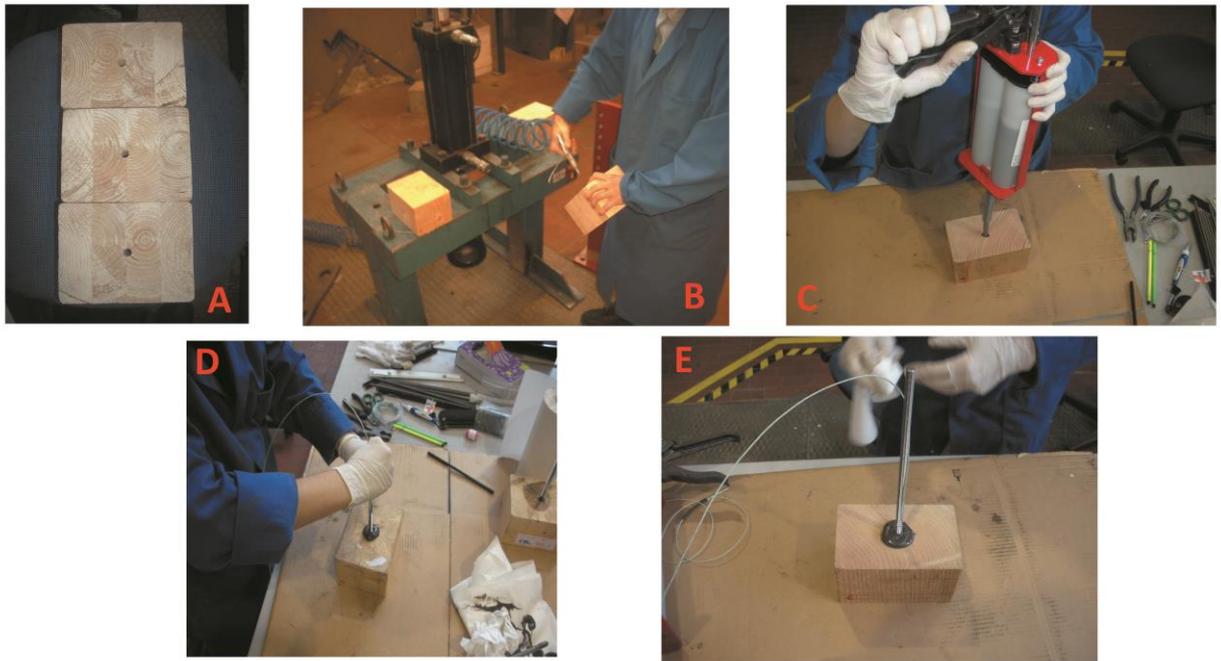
installation method for glued in rod joints: drill a hole according to the designed shape, diameter and depth (A), clean the hole through several blows and brushes (B), insert the epoxy following the installation method suggested by the manufacturer (C), insert the threaded steel bar twisting with a back and forth movement (D), sample ready for curing process (E)
